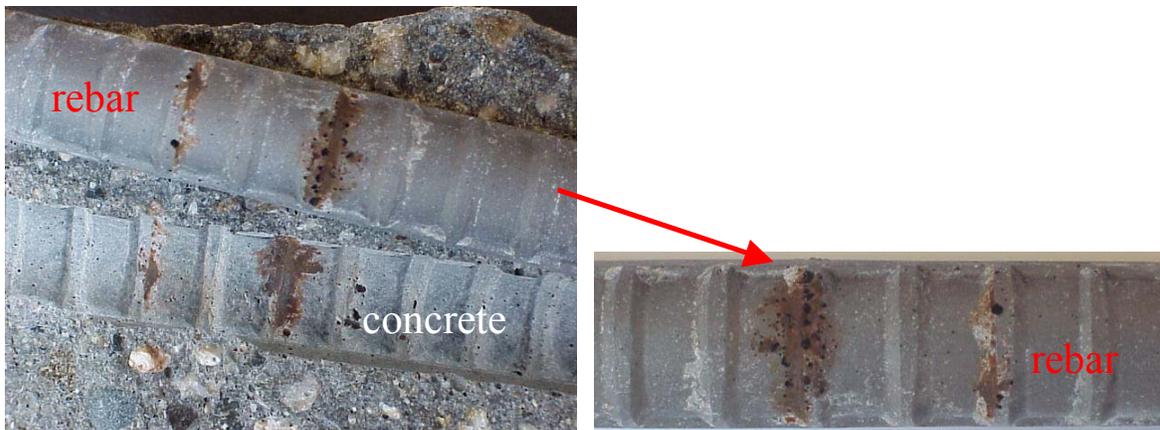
Untreated low density concrete sample with corrosion rust products near the ribbing of the rebar and stains on the concrete. Photo on the right is an enlargement of the rebar.
